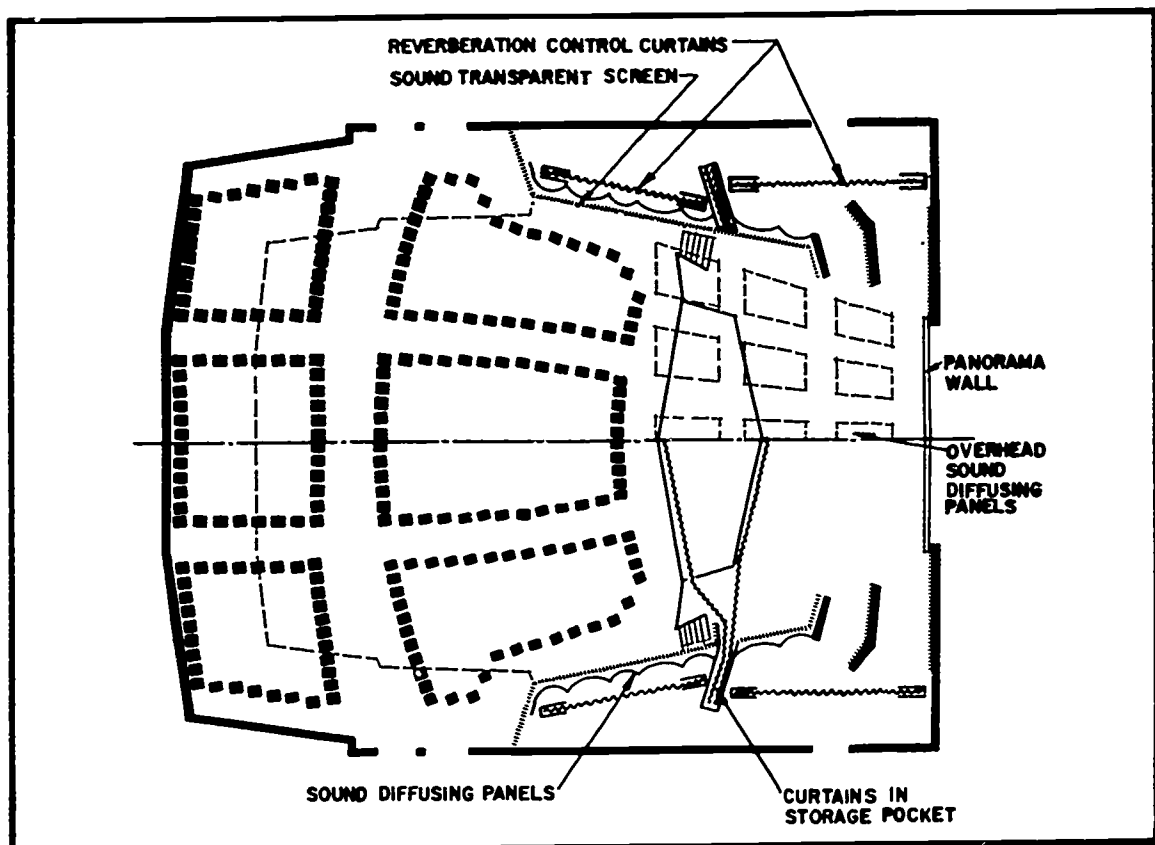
Plan of a multi-purpose, open-stage auditorium for a hypothetical campus showing partial height sound-diffusing panels.
